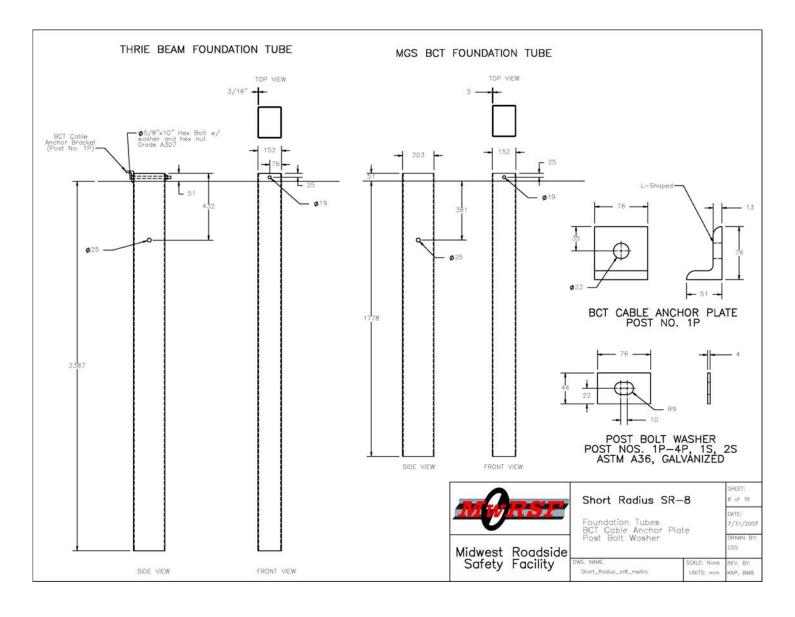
MGS Foundation Tube and Thrie Beam Foundation Tube Details
